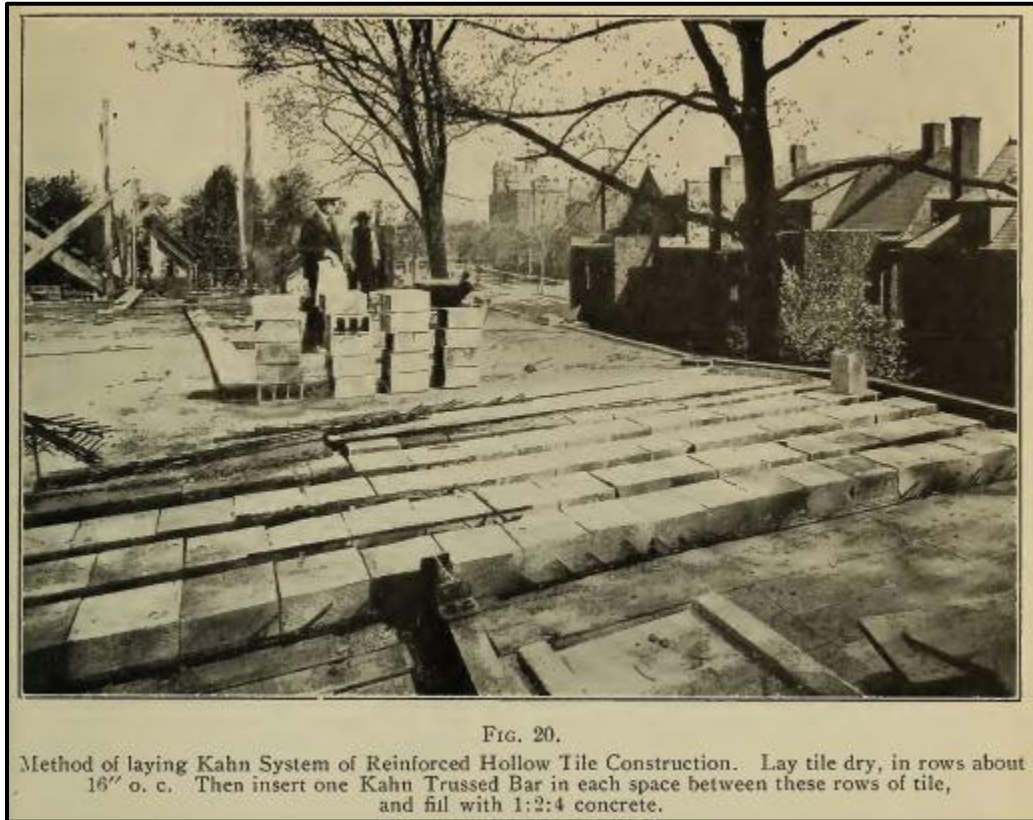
The Kahn System of Hollow Tile Floor Construction being Constructed.
